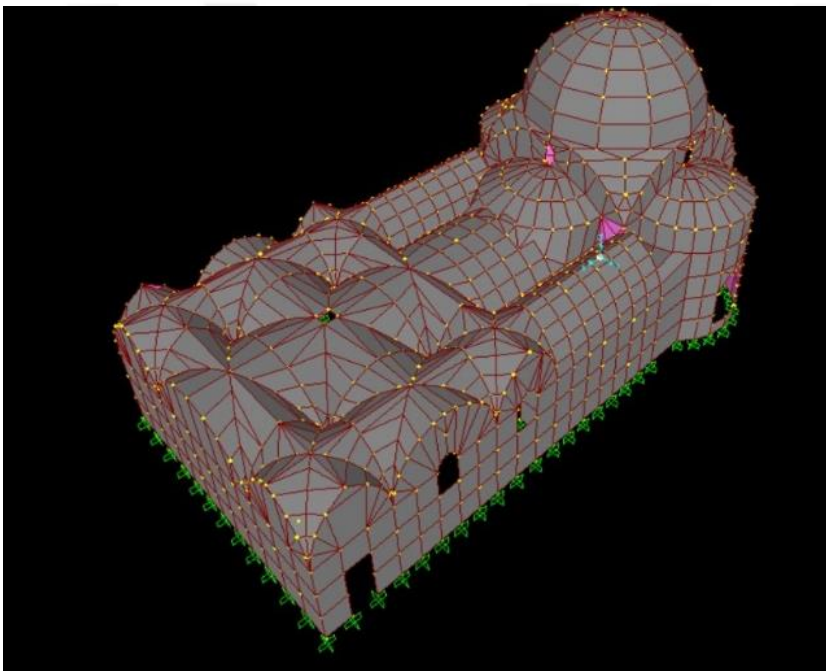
Surp Simon Church Finite Element Model (SAP2000)
